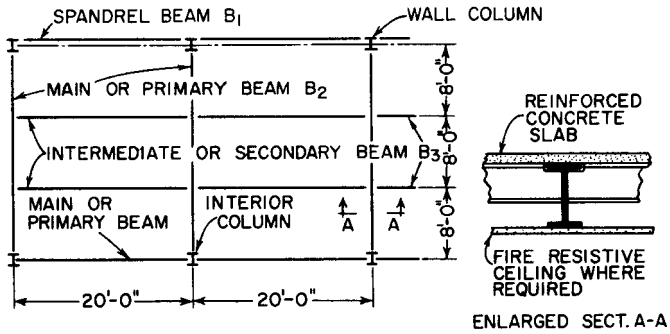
Typical beam-and-column steel framing, shown in plan.
